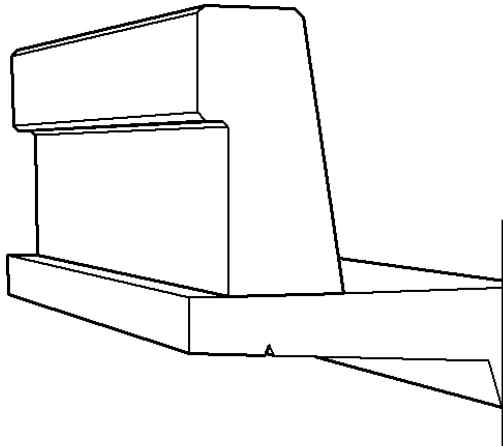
Slope Paving Architectural Treatment
